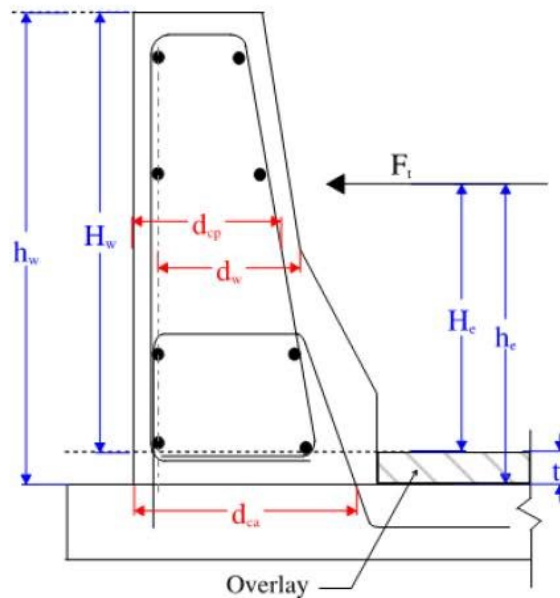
Sketch of Concrete Wall/Parapet Showing Input Variables
